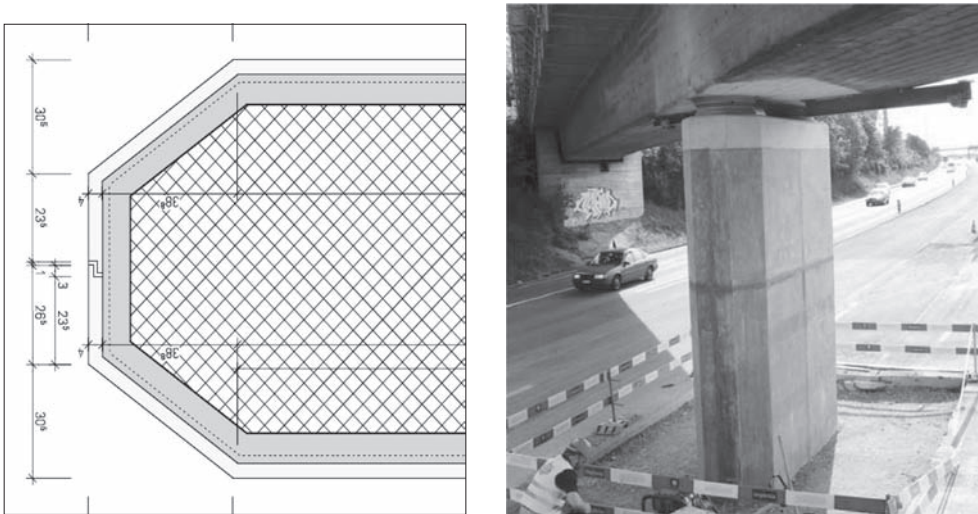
Cross section and general view of the rehabilitated bridge pier.
